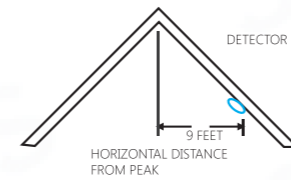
Recommended locations to mount smoke detectors in rooms with sloped, gabled, or peaked ceiling
